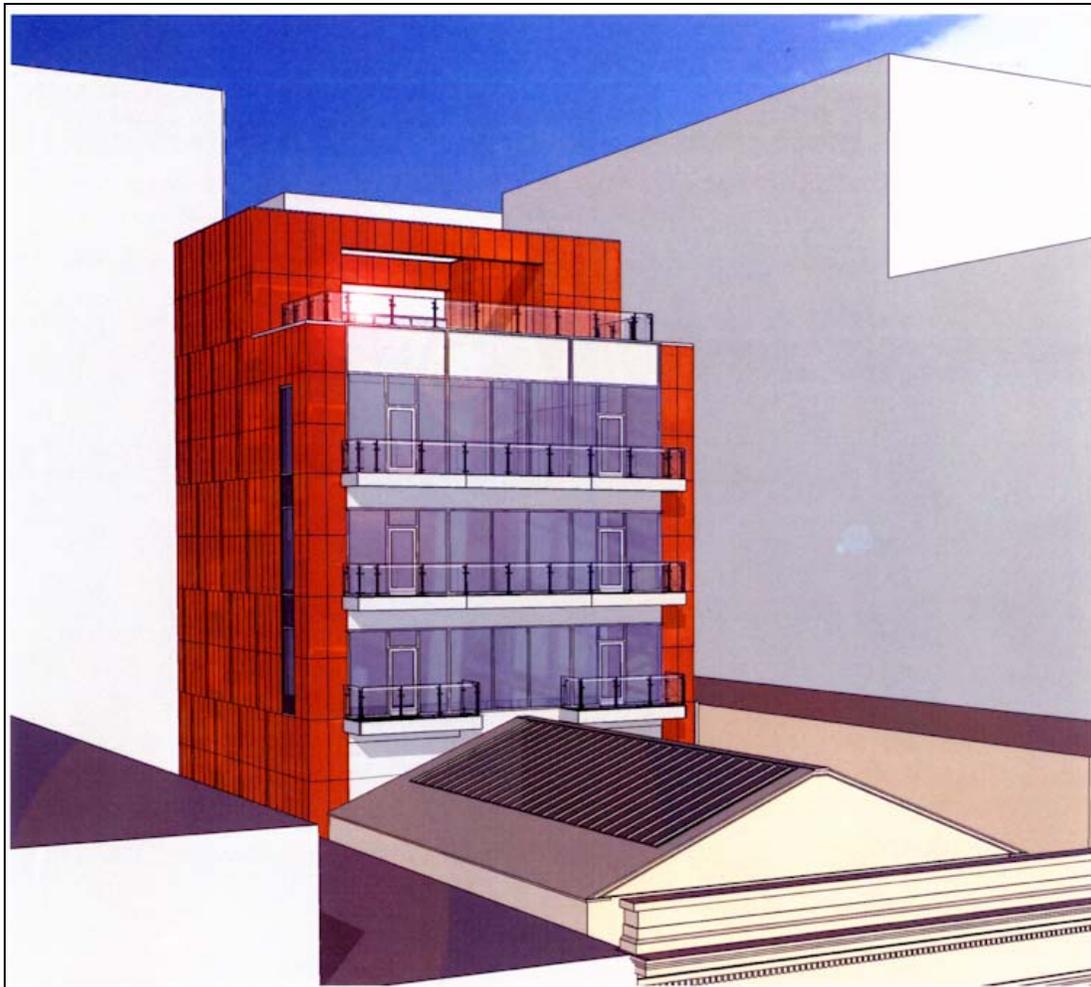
Rear addition at 915 F Street NW clad in glass and Cor-ten™ weathering steel
